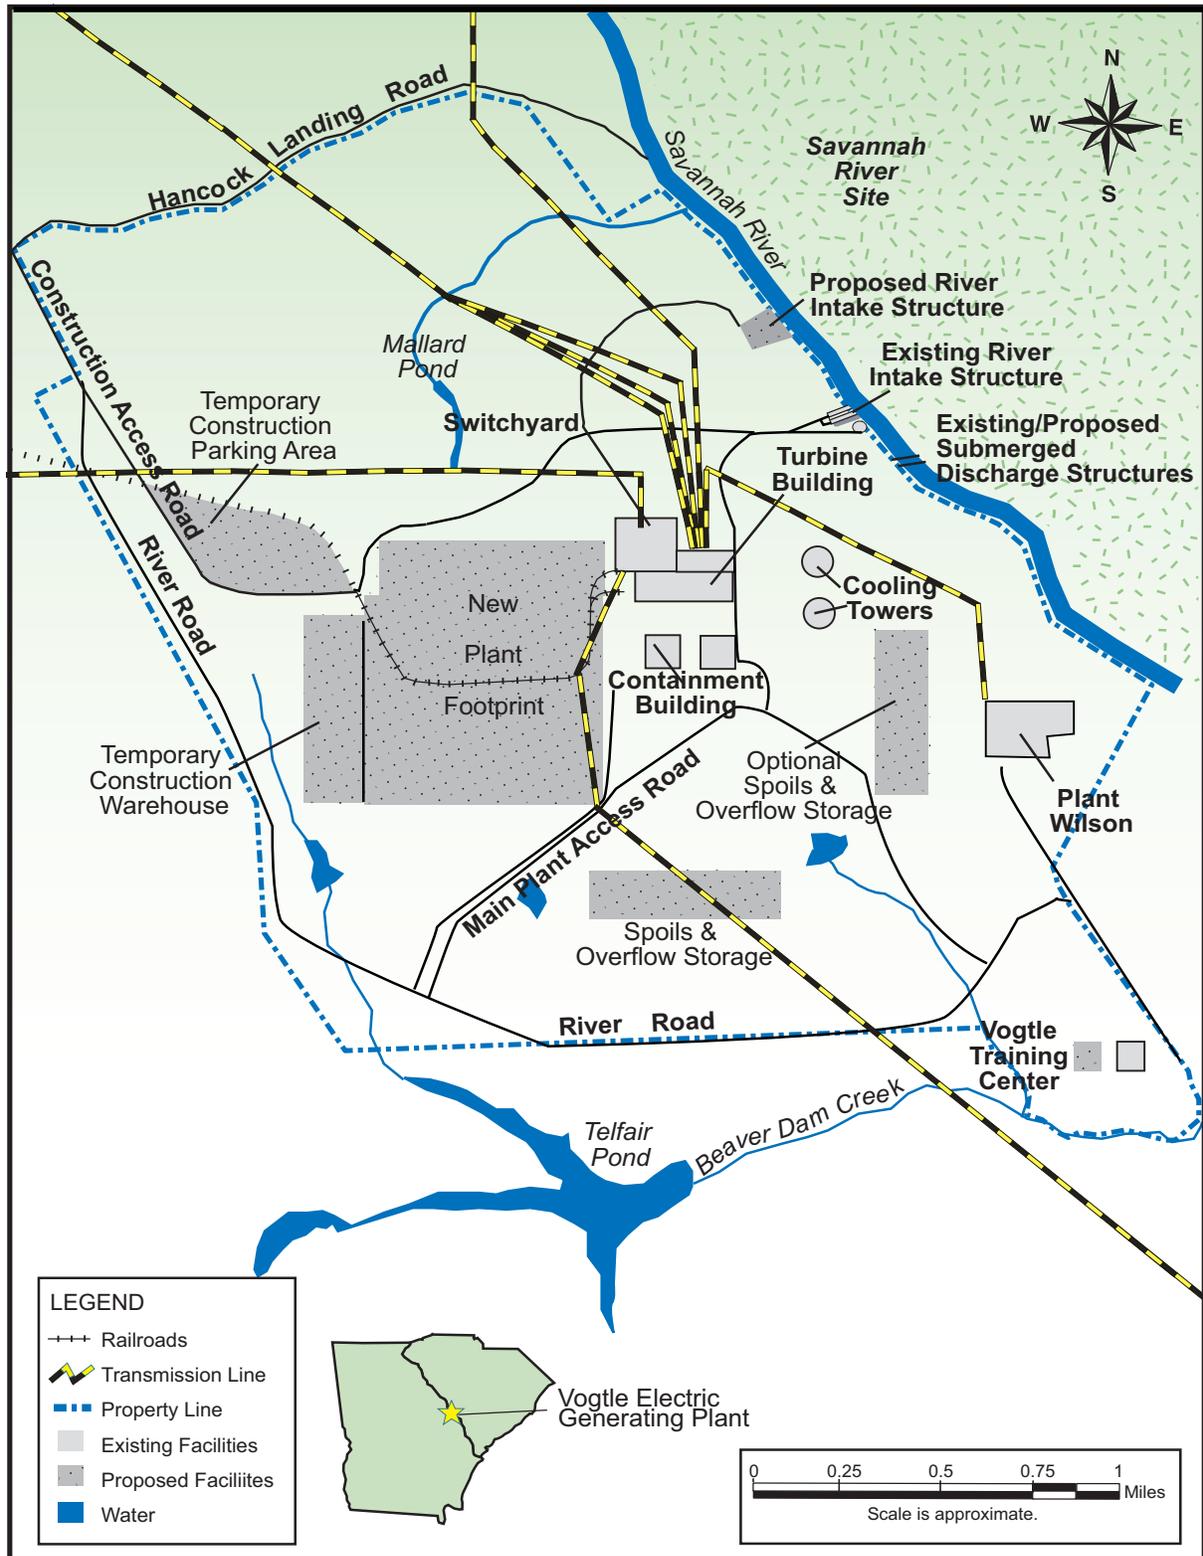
VEGP Site and Proposed New Plant Footprint
